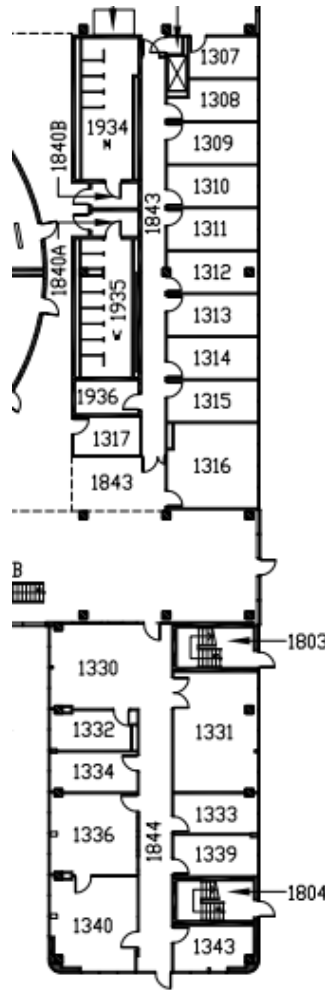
Sample floor layout showing room numbering for hallways, washrooms, and stairwells.
